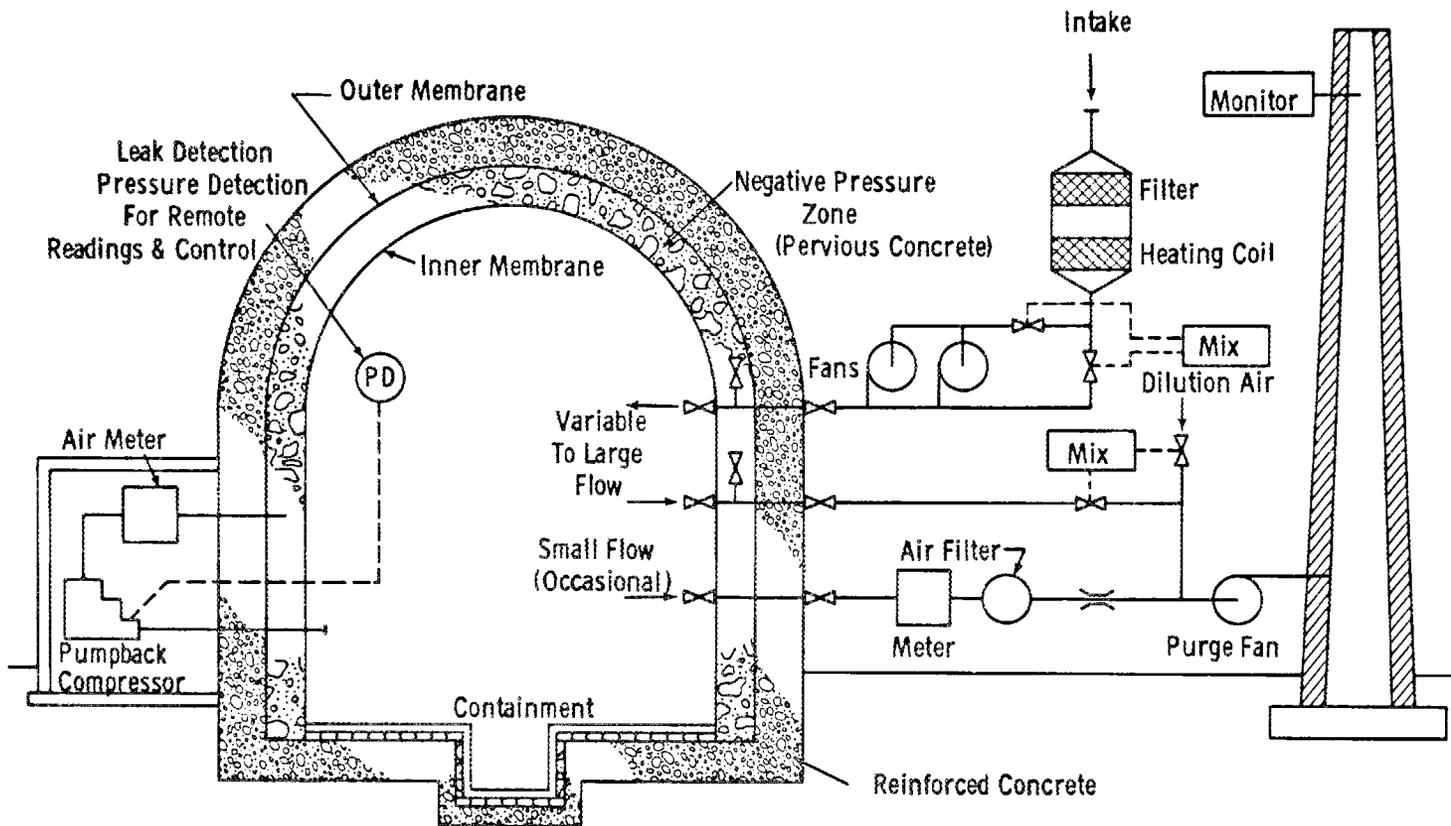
Diagram of Reactor Containment System for the Ravenswood Plant. (From ref. 66)
